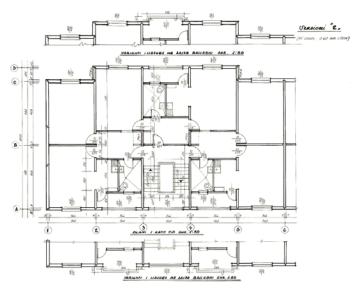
Plan of Module 2, variation with lodge and balcony © AQTN
